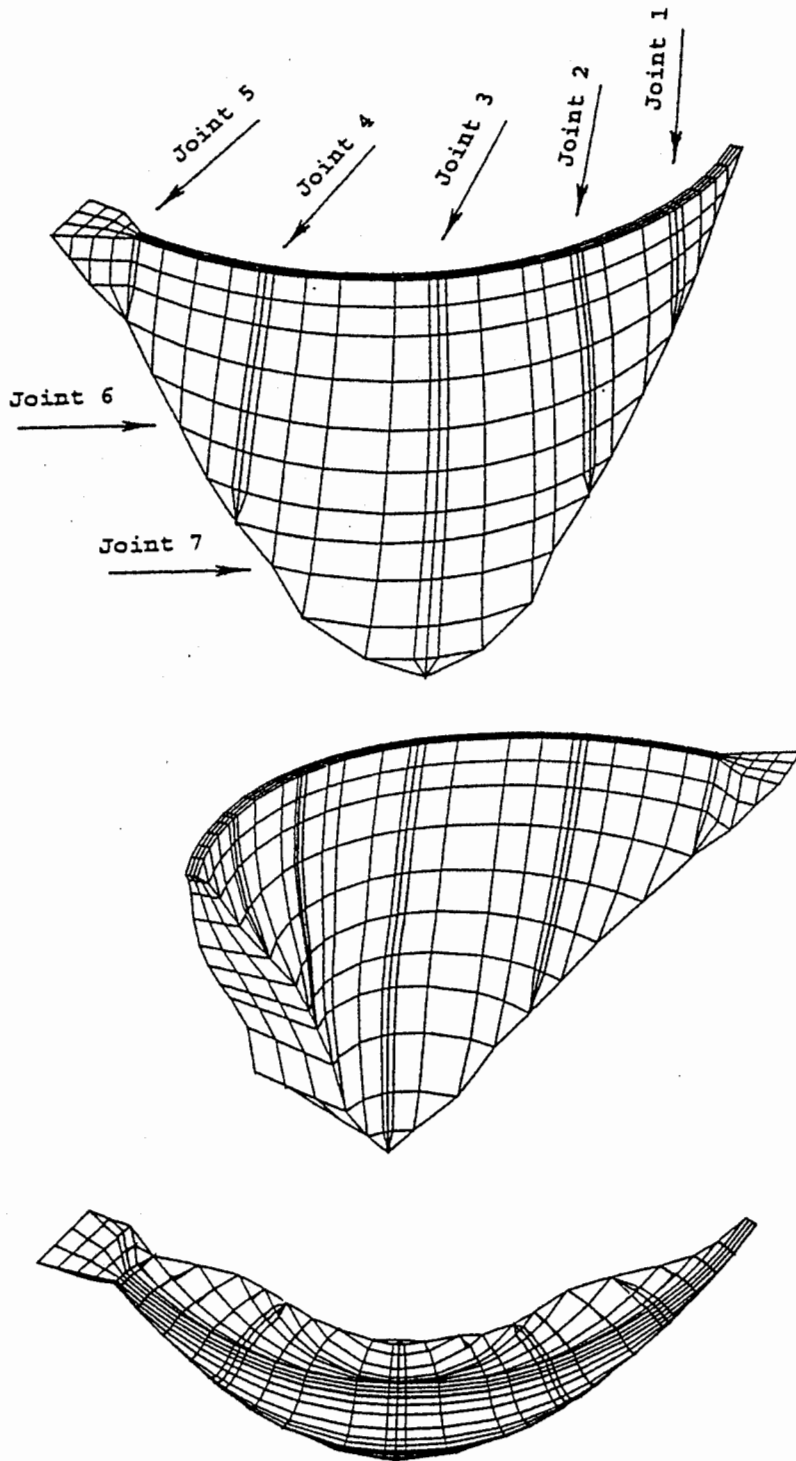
Finite Element Model of Pacoima Dam, Showing Locations of Vertical and Horizontal Joints. (Reservoir and Foundation Rock Not Shown.)
